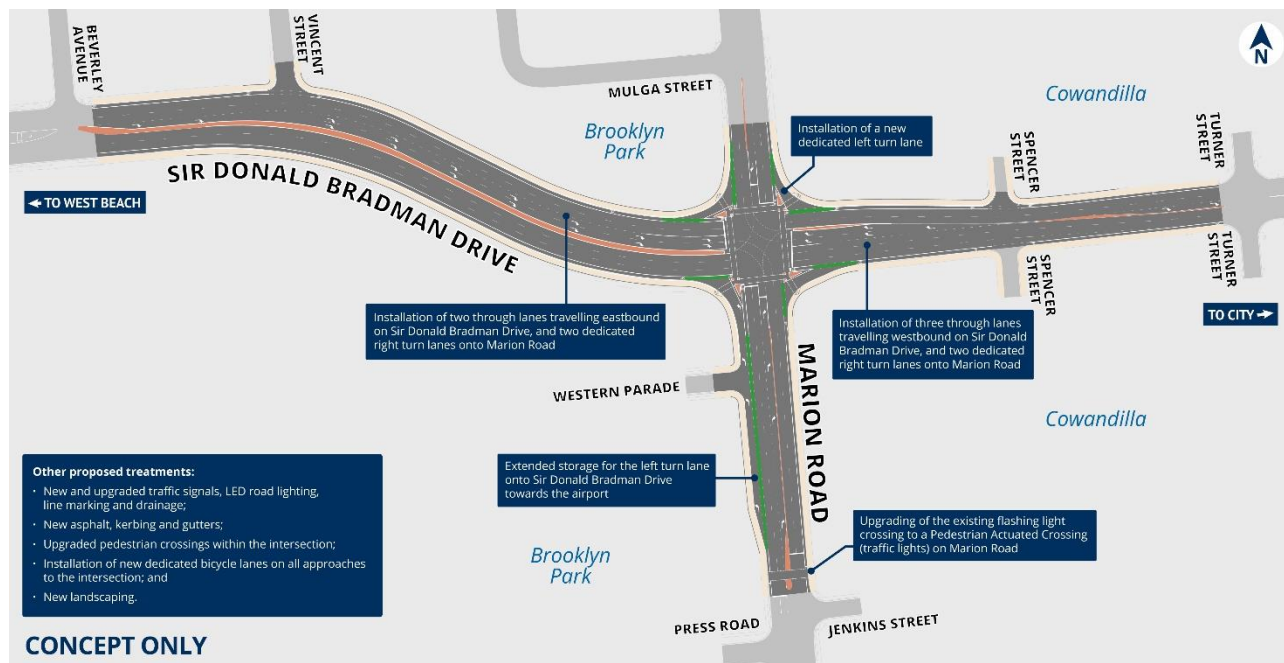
Concept plan for the Marion Road and Sir Donald Bradman Drive intersection upgrade (Source: DIT)
